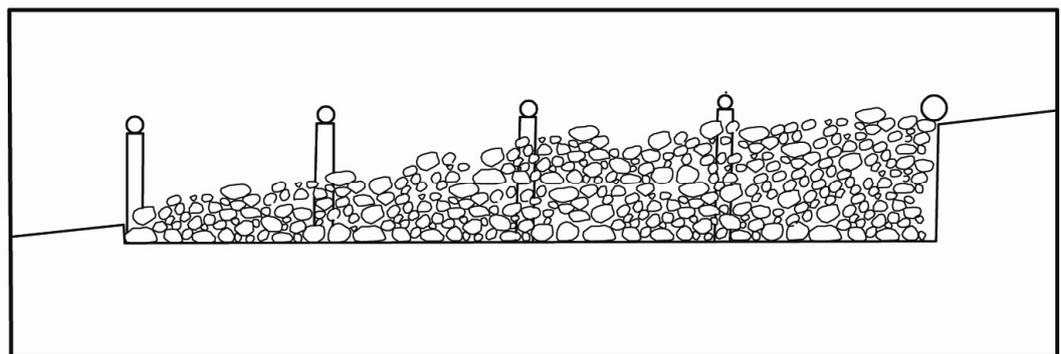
a. View from east- the section of the House D showing the placement of the lintels.
